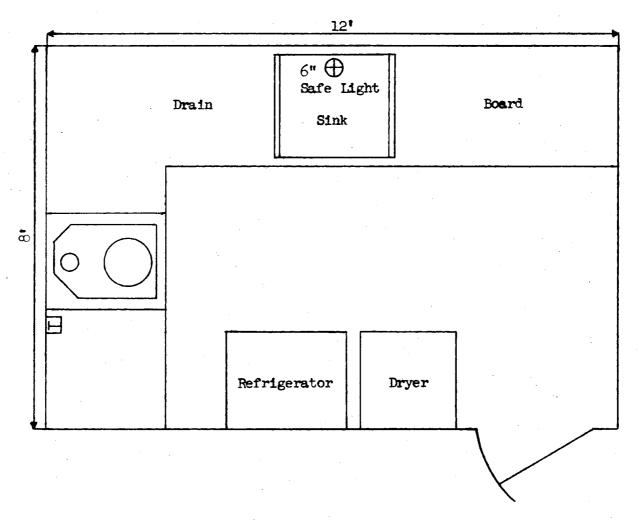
DARKROOM FLOOR PLAN - PAULS VALLEY DAILY DEMOCRAT. (SCALE 1/2" = 1')
